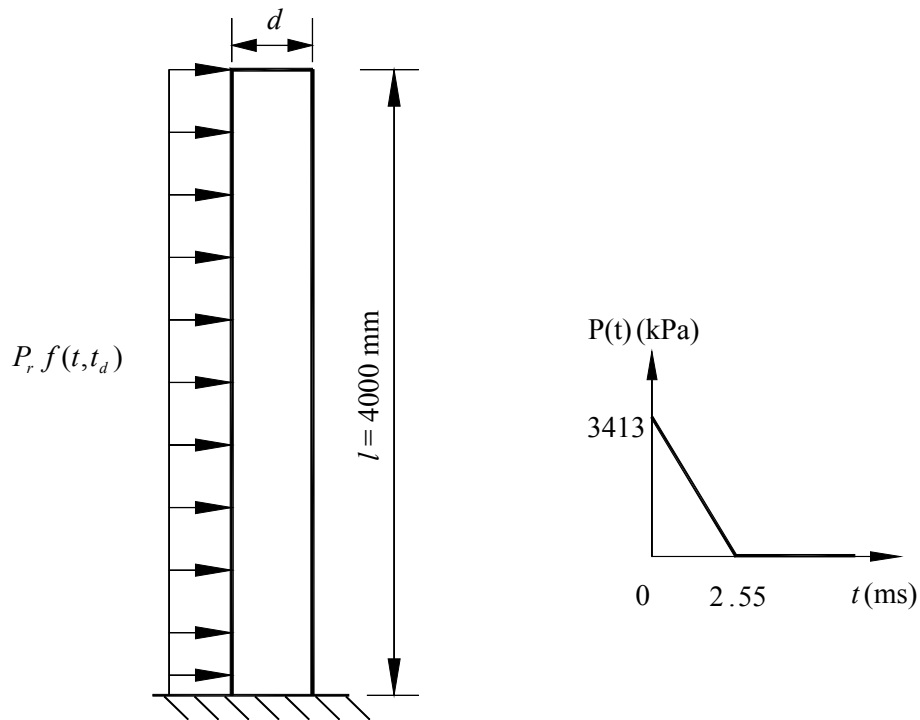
A cantilever wall under the blast loading (Design example II)
